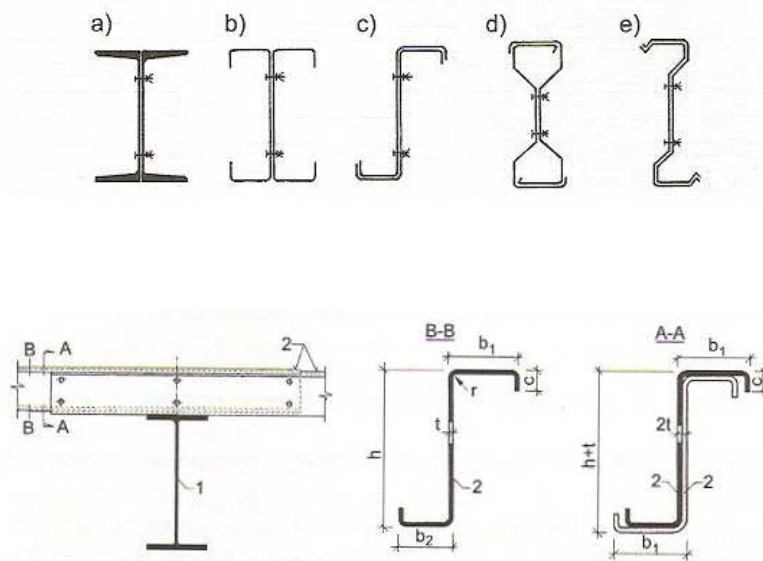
Doubled purlin cross-sections and the example of their connection to a roof rafter:
